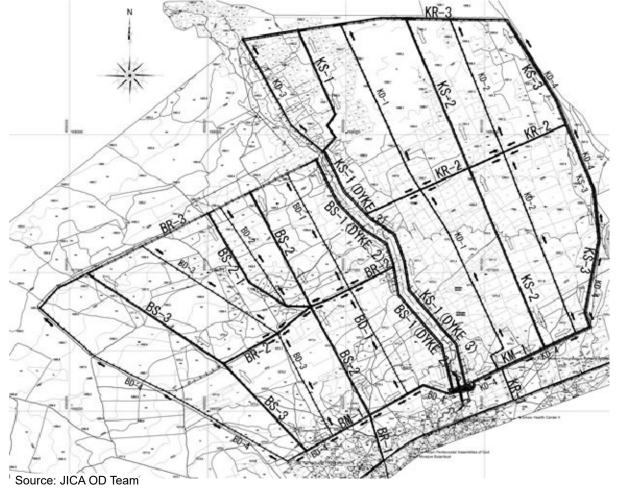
Plan of Farm Road Arrangement
